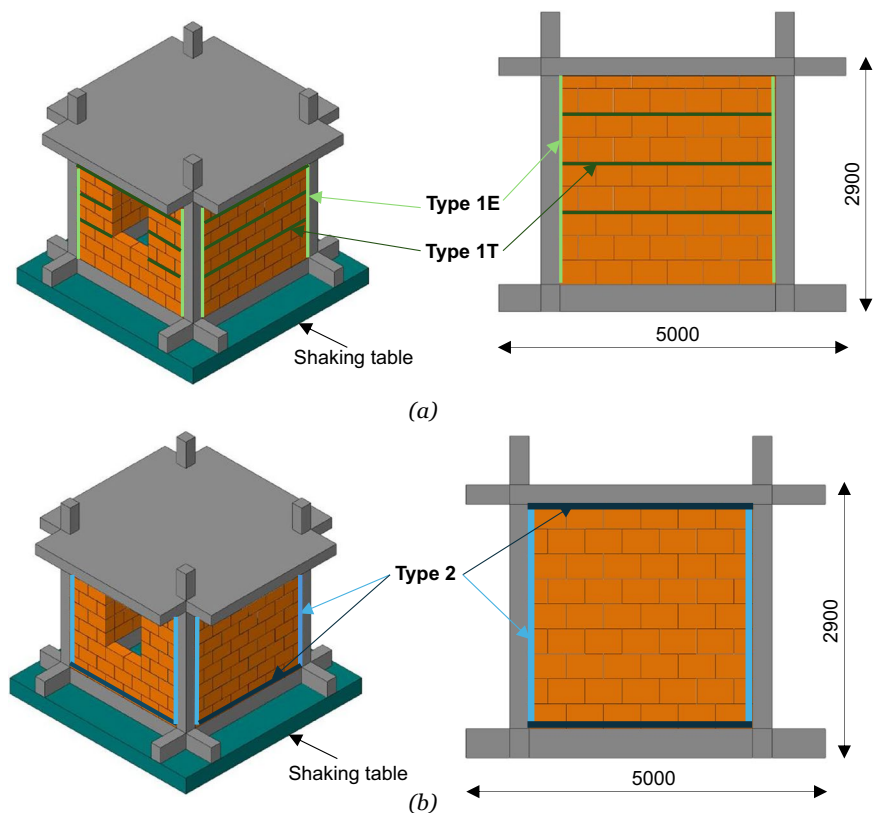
(a) 3D view and geometric details with Type 1 joints. (b) 3D view and geometric details with Type 2 joints. (Dimensions are in mm).
